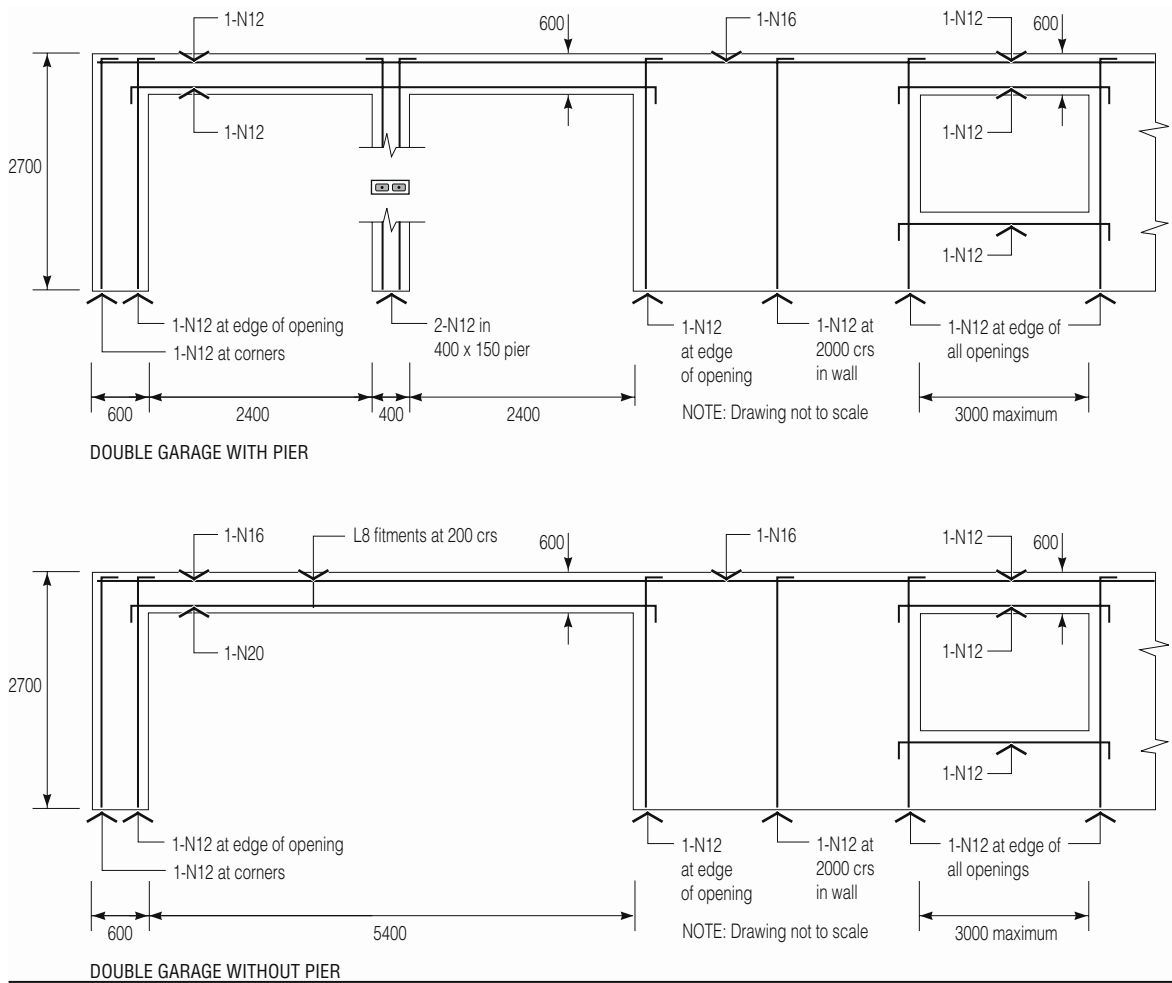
Wall Reinforcement for 140-mm Leaf for Wind Classifications N1, N2 and N3 and 2700-mm Wall Height
